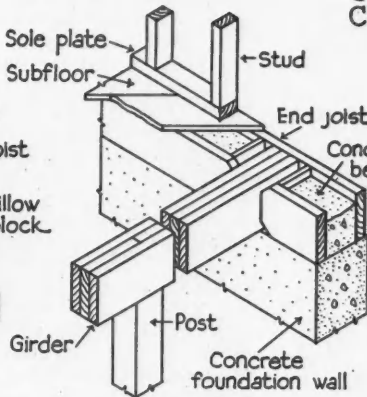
BUILT-UP GIRDER END SET ON CONCRETE WALL
